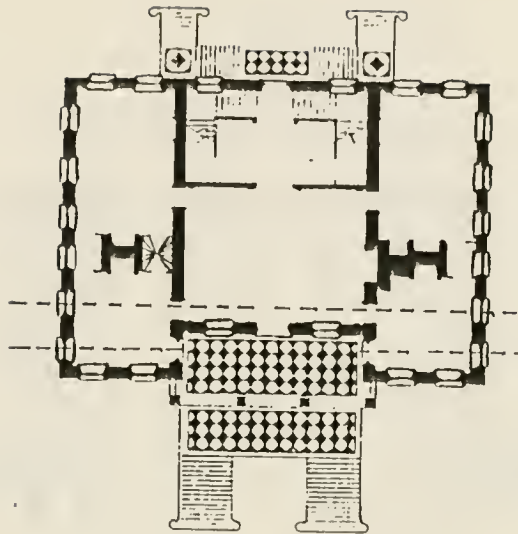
First floor plan of Drayton Hall, as built (RGF after Chase and Murphy). Note correspondence of wall openings on the portico side.
